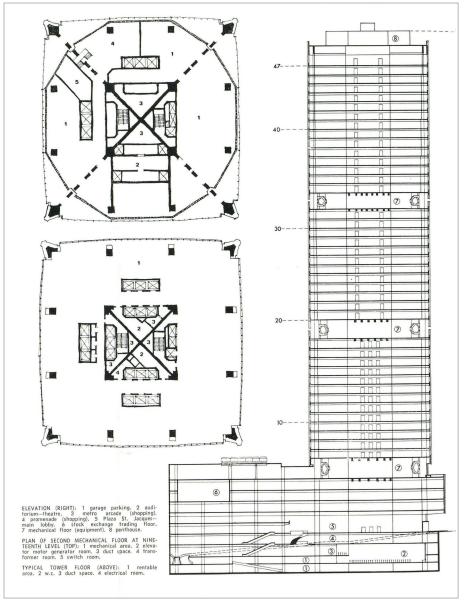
THE BUILDING SECTION (RIGHT) ALONG WITH FLOOR PLANS OF A MECHANICAL FLOOR (TOP LEFT) AND OF A TYPICAL RENTABLE OFFICE FLOOR (BOTTOM LEFT) SHOW THE PRIMARY CONCRETE STRUCTURE AT THE CENTRE, THE SECONDARY STRUCTURE OF COLUMNS, CORNER COLUMNS, AND THE CURTAIN WALL. | THE CANADIAN ARCHITECT, 1965, VOL. 10, NO. 7, P. 44.
